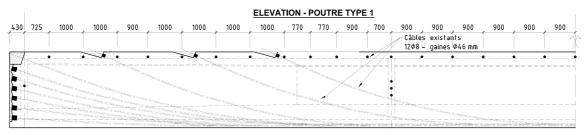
longitudinal cross section of a typical beam - existing post tensioning cables layout
